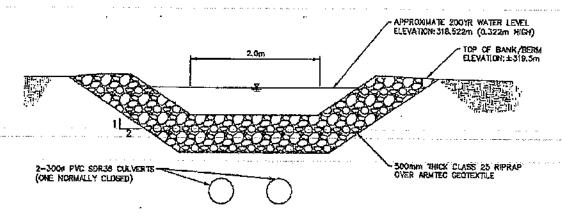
SPILLWAY SECTION FROM AS-BUILTS
